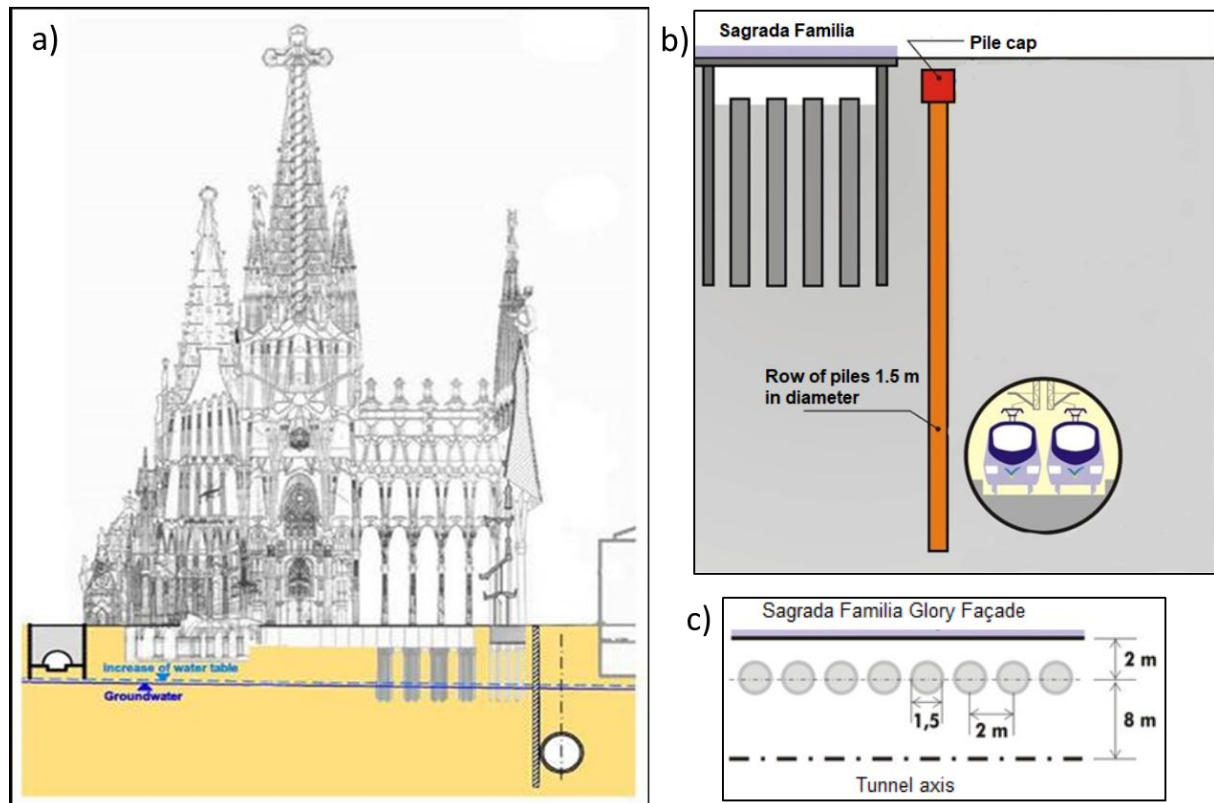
a) Sketch of the basilica including the pile wall and the tunnel at the right. On the left, there is an old Metro tunnel close to the surface. b) Detail of the pile wall and the tunnel. c) Plan view of the row of piles separating the tunnel and the basilica.
